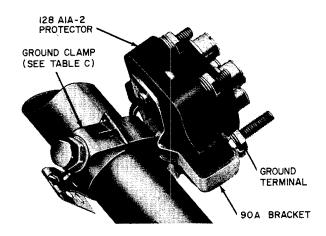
128A1A-2 Protector Installed on a Metallic Water Pipe
